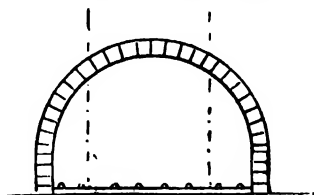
Section showing Arching to support Roof and Sides at Shaft Bottom
